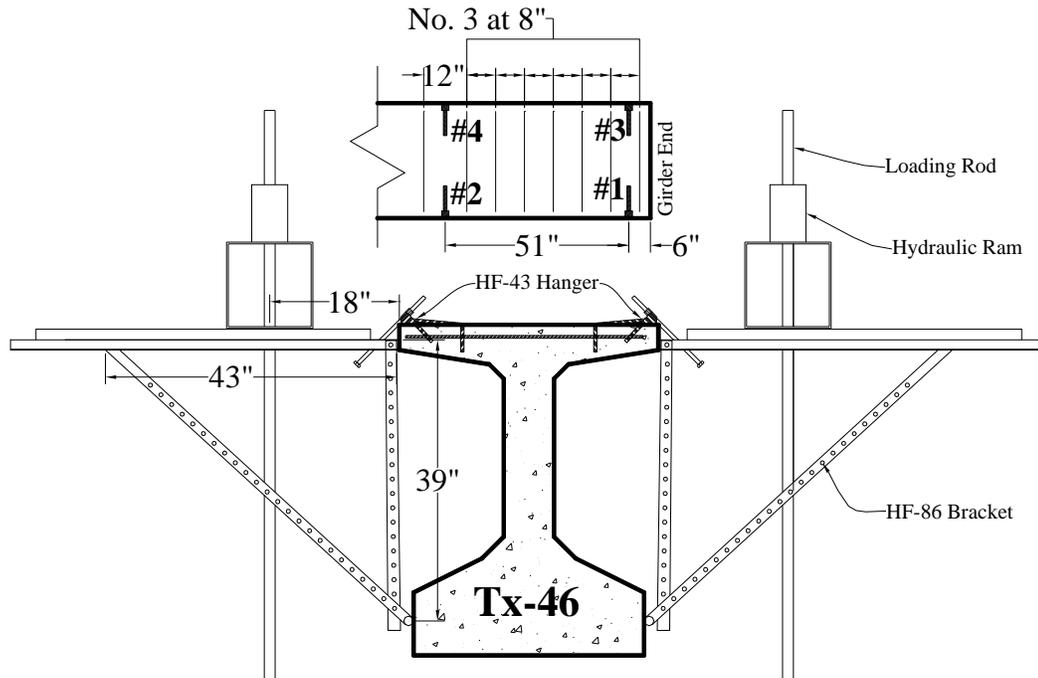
Reinforcement pattern and loading geometry for HF-43 on Tx-46
